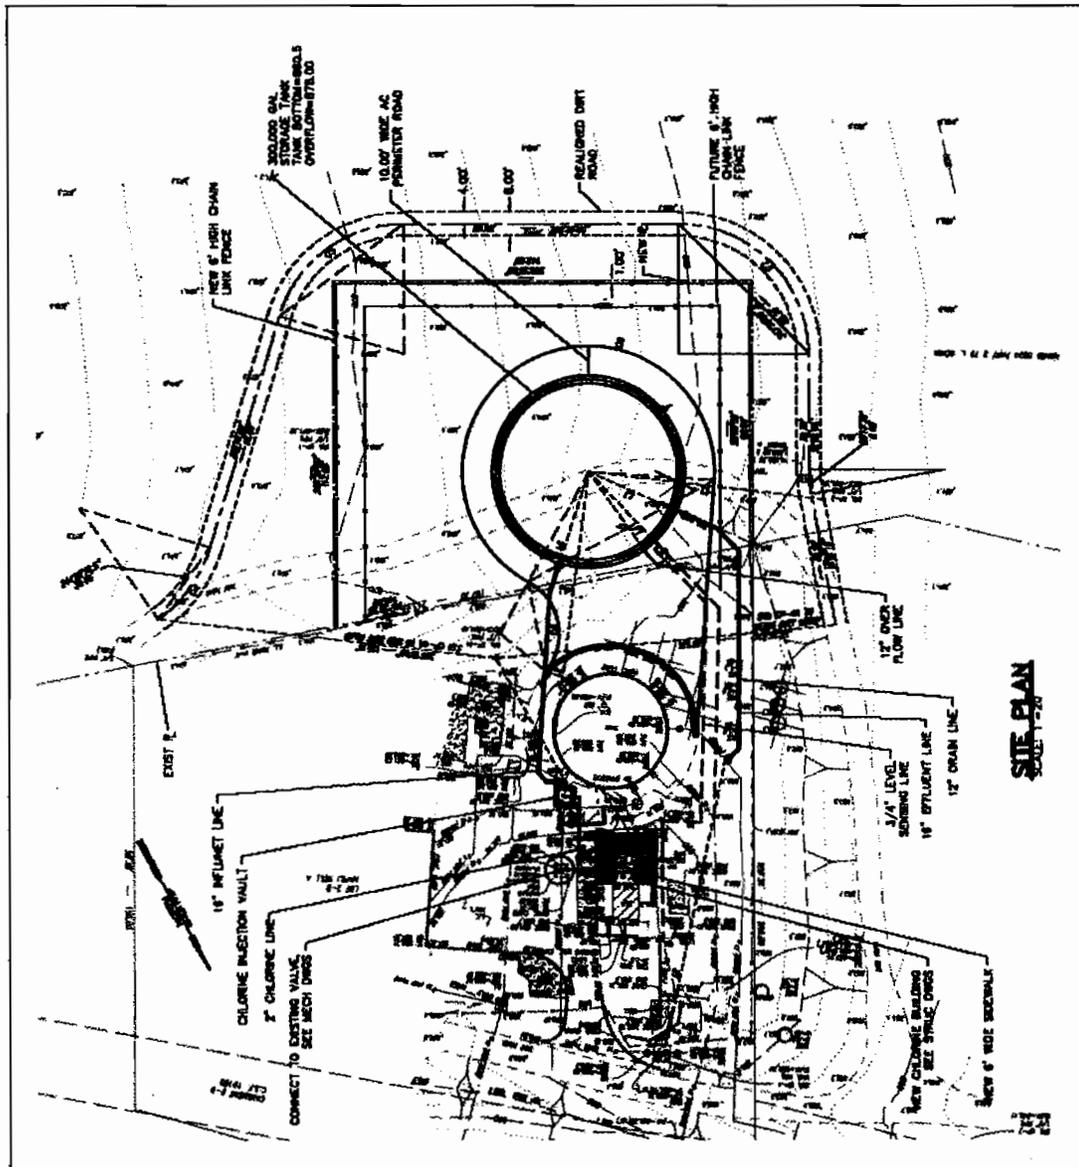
Plan map with proposed location of the new DWS 300,000 gallon water tank, Napili. Note: existing County of Maui DWS facility is adjacent to and northwest of the planned tank.
